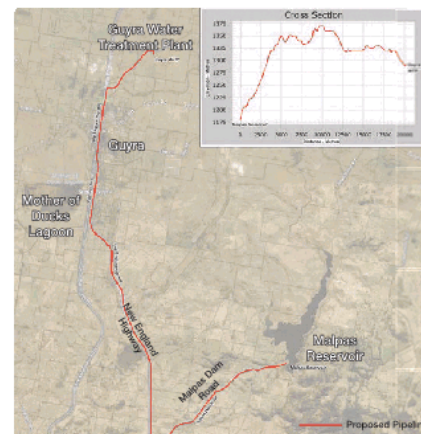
Malpas Dam to Guyra proposed pipeline plan
